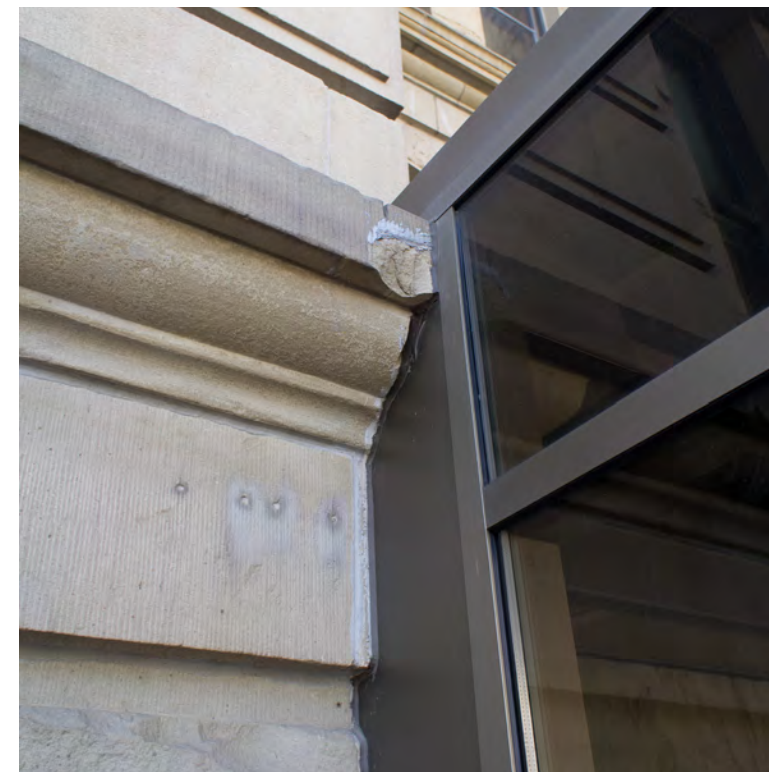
Spalled Stone Adjacent to Glass Enclosure at the North Elevation.
